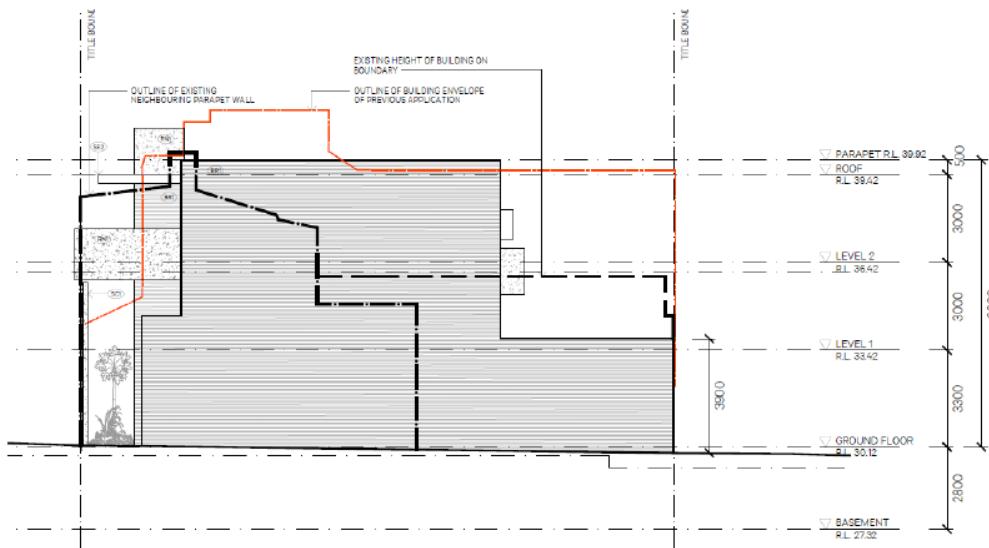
Comparison of existing, approved and proposed South Elevation of the site
